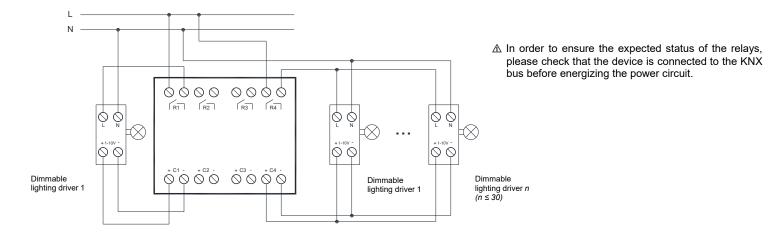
(From left to right) Wiring examples for single driver and several drivers in parallel
